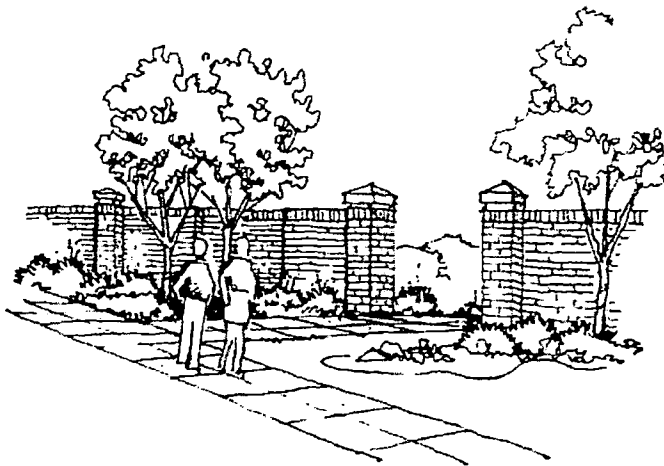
B: Pedestrian access opening in a perimeter wall
